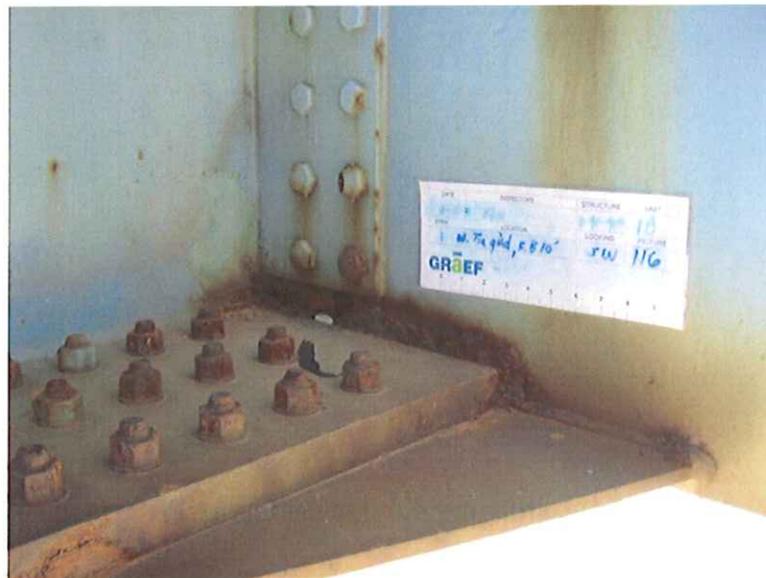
Tie girder web - typical laminate rust at floor beam bottom flange gusset
